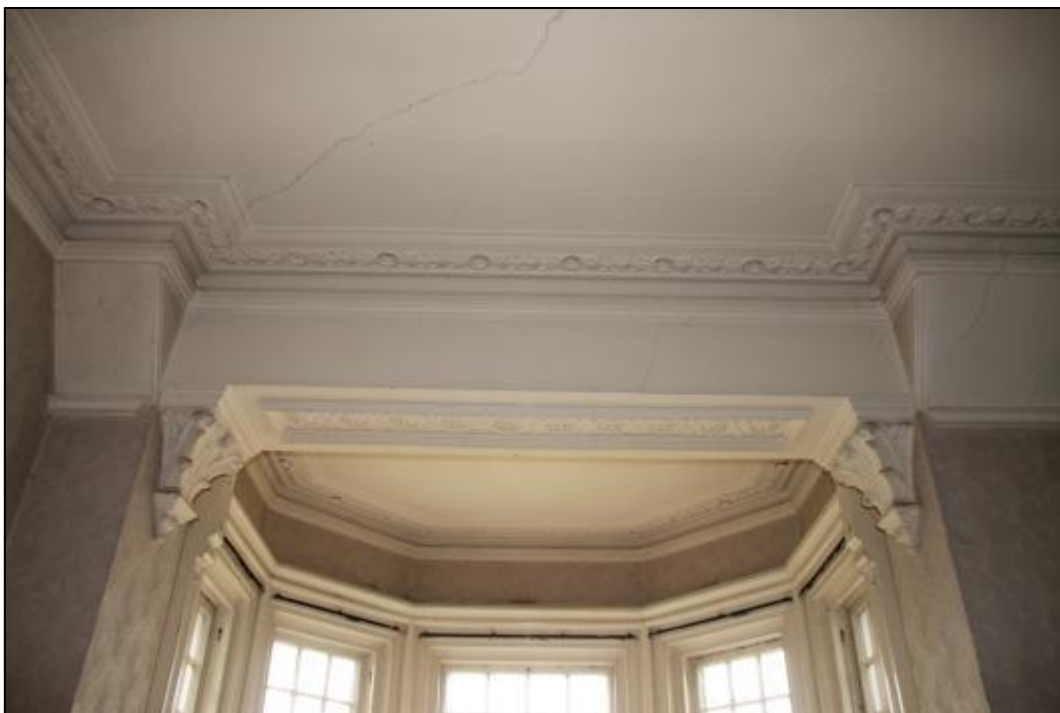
Detail of decorative plasterwork to joist above bay in Room F4
